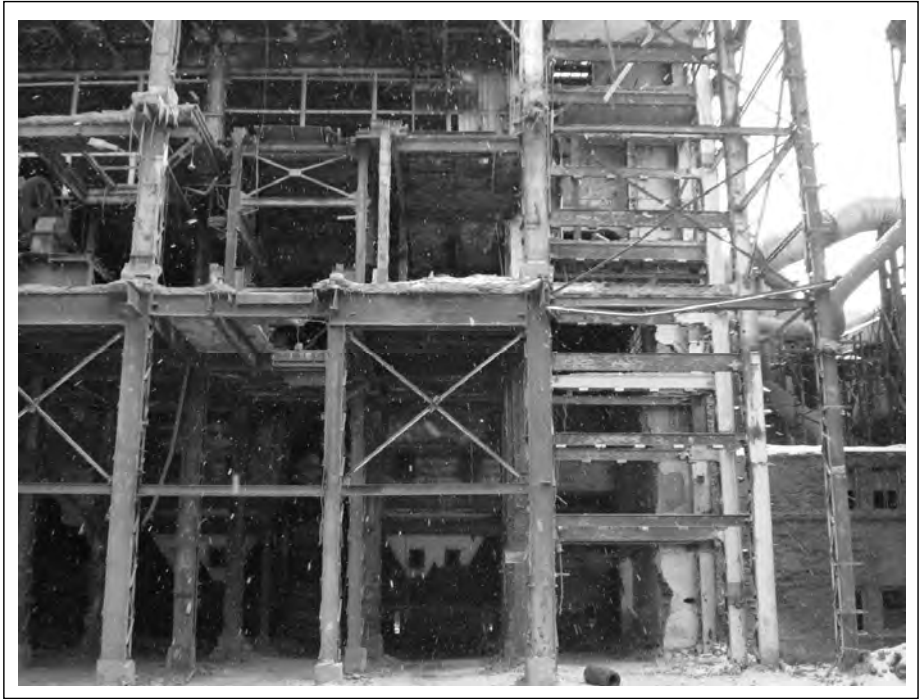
Construction site for the Lead ISASMELT™ Plant at UKMC
